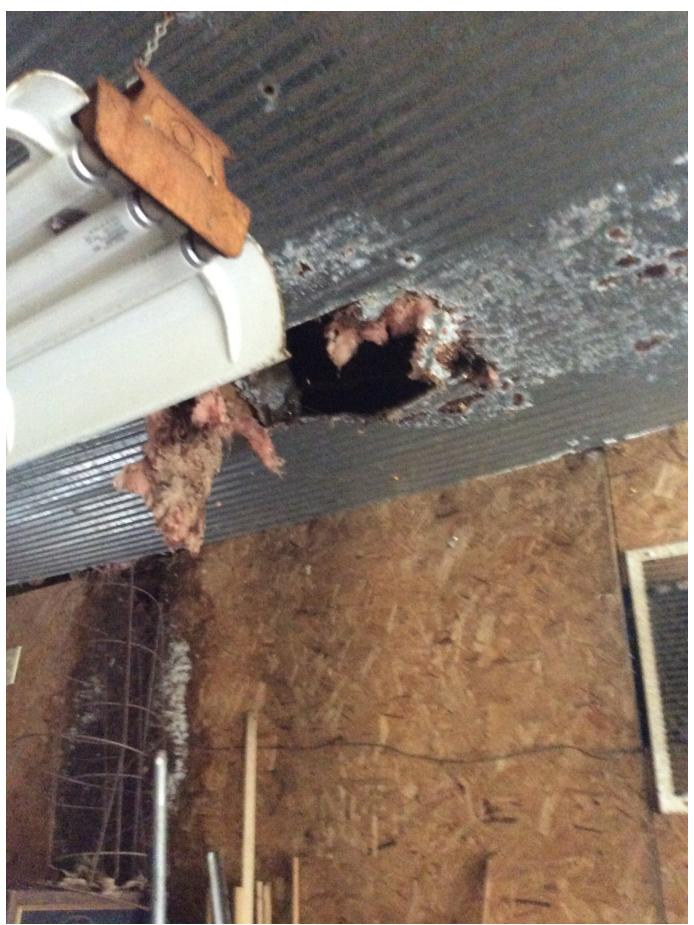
Evidence of sustained water damage in corn crib garage bay.
